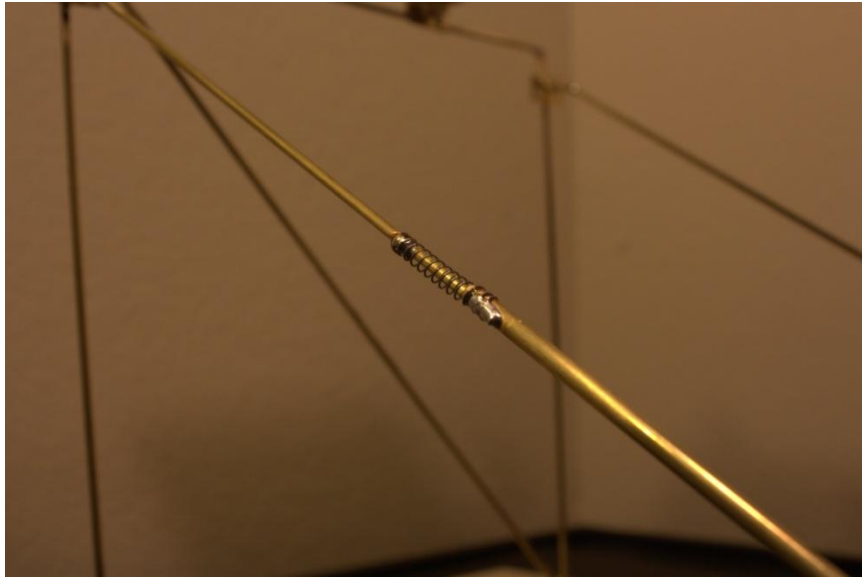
Foreground: in-plane bracing with spring element and without friction damper
